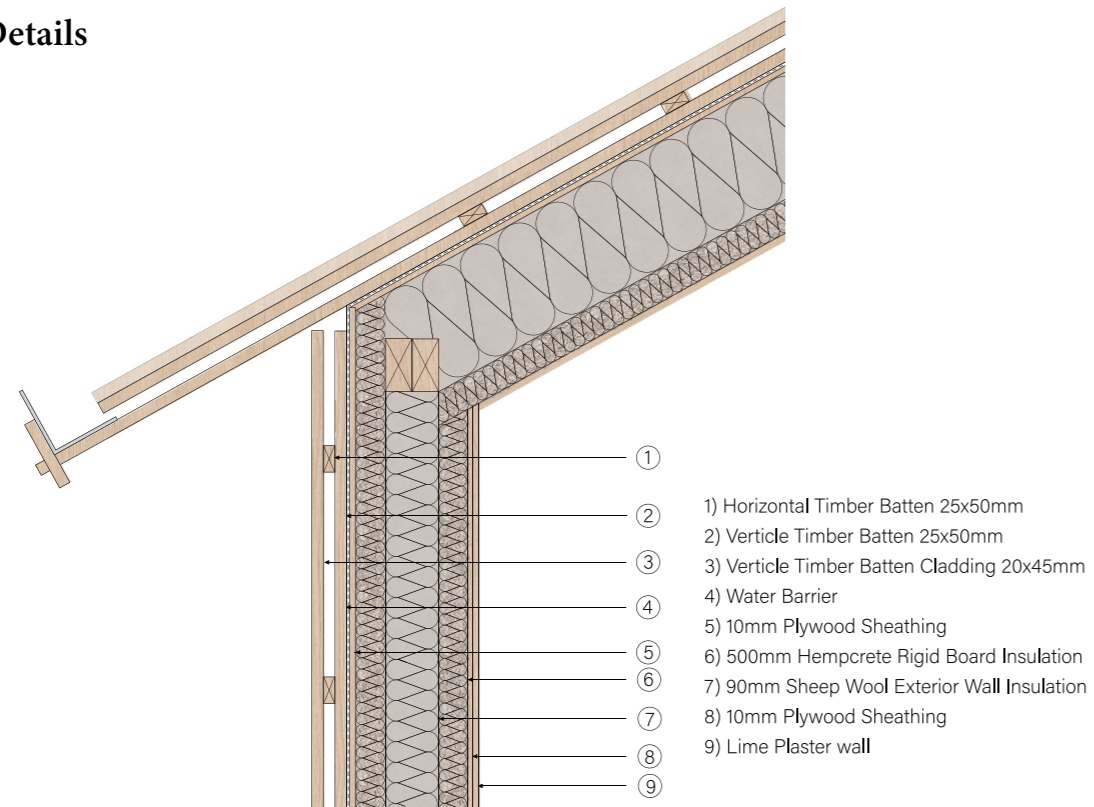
Timber Roof Detail Drawing Version One (Scale 1:200)
